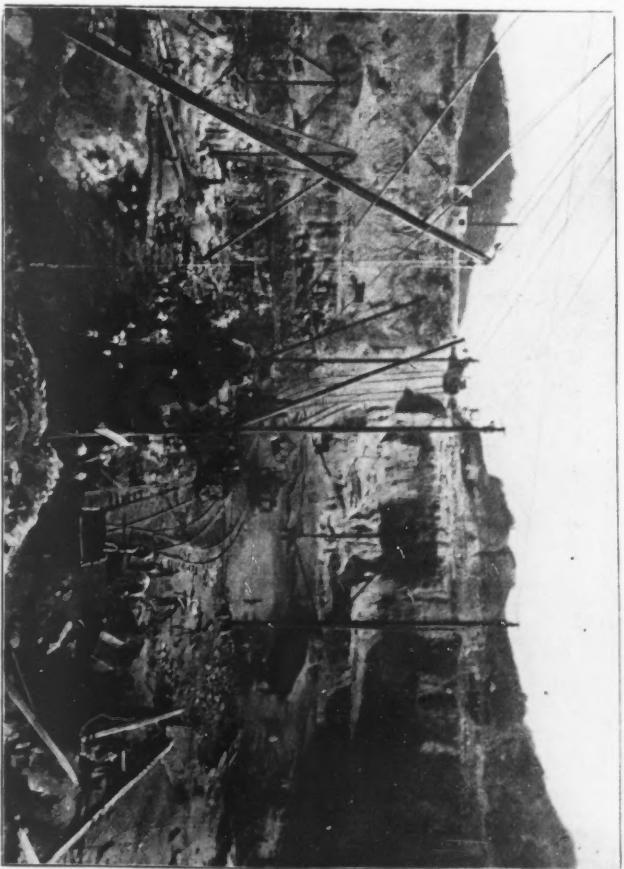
LOOKING EAST, SEPT. 30, 1896. EXCAVATION AS SEEN FROM FOOT OF INCLINE RAILWAY, No. 3.
